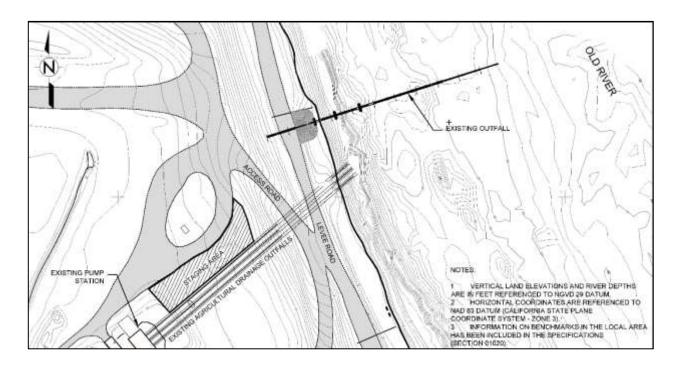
Schematic of Existing Outfall and Diffuser and Proposed Project
